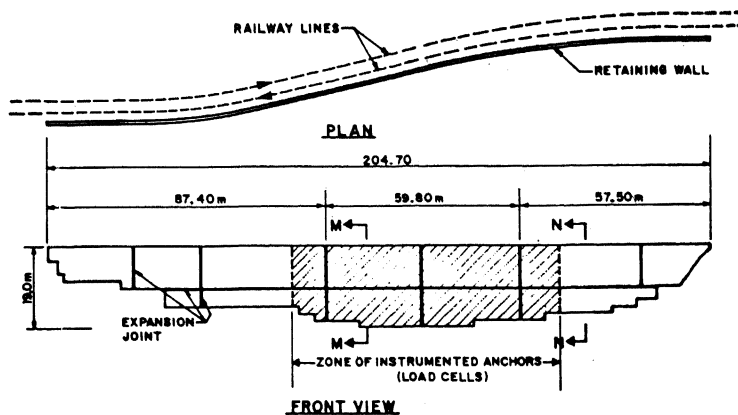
LAYOUT OF THE ANCHORED RETAINING WALL
